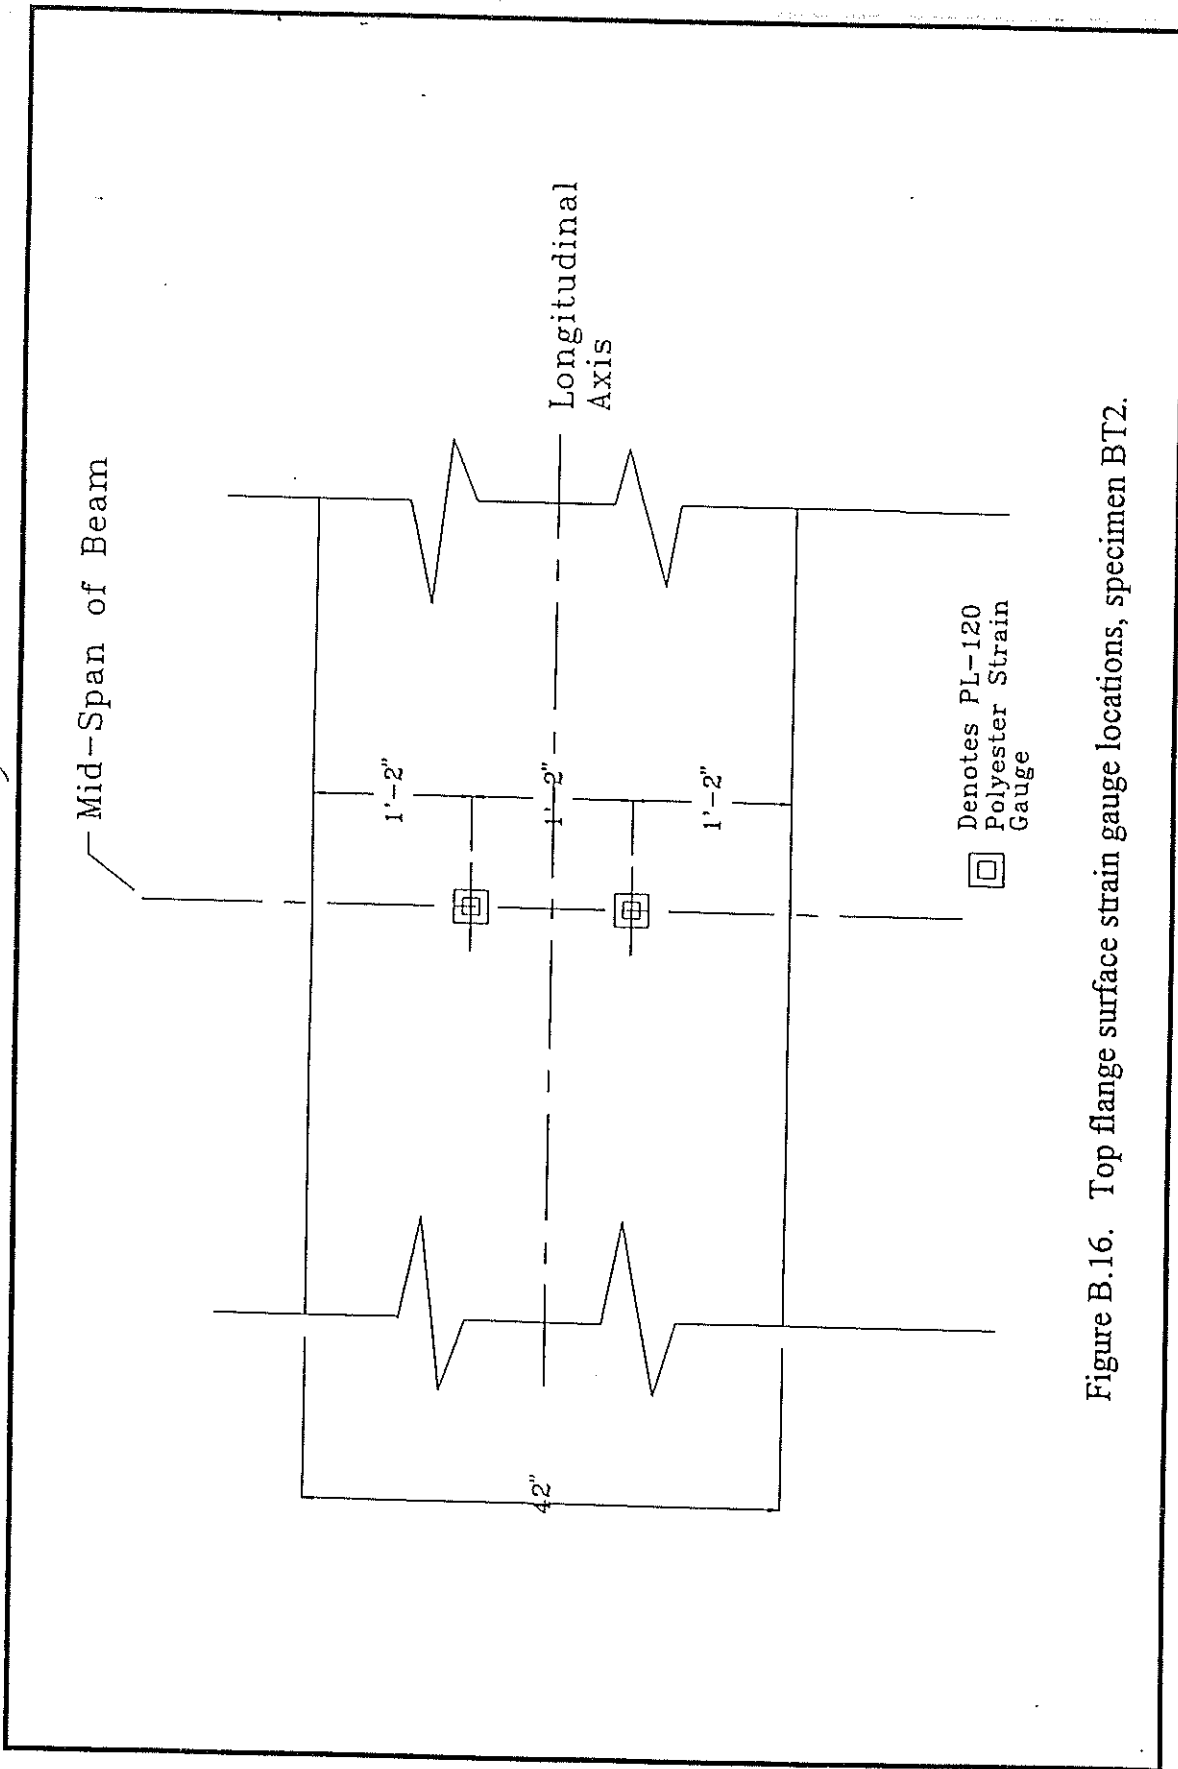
Top flange surface strain gauge locations, specimen BT2.
